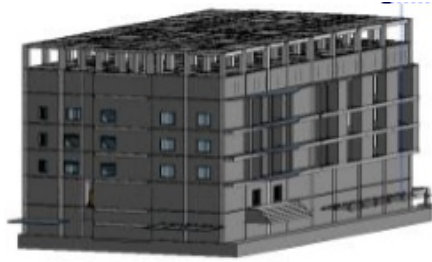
6th floor level beam Figure 28: 7th floor level and slab, 4th FL wall and floor and column and 6th floor level stair and 3rd FL D & W for phase 17 shear wall, 5th floor level wall and floor and stair and 4th FL doors and windows for phase 18
